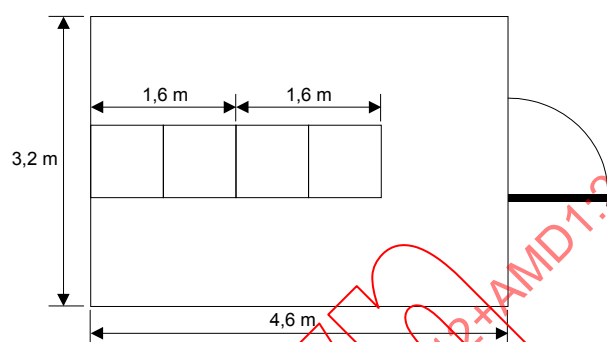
Minimum room dimensions to support distributors containing between 501 and 1 000 outlets
